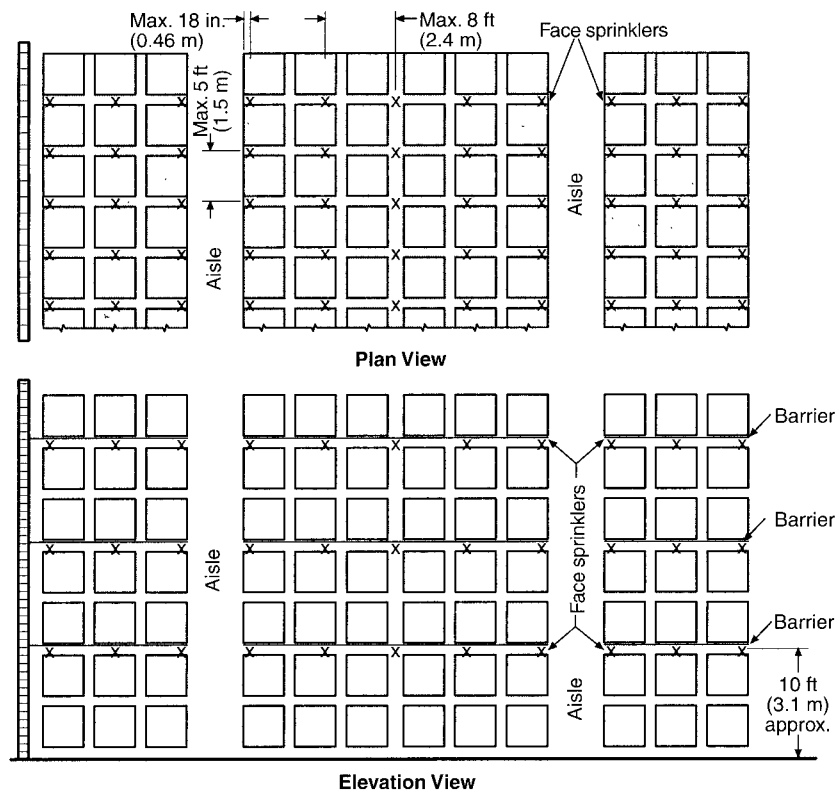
(d)* In-rack sprinkler arrangement, multiple-row racks, cartoned plastic and exposed unexpanded plastic, storage height over 25 ft (7.6 m).
